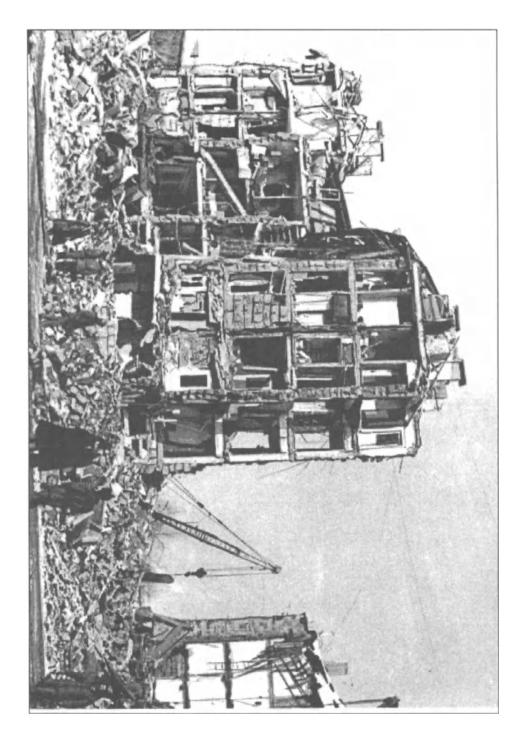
Damage to residential masonry buildings in Leninakan.
